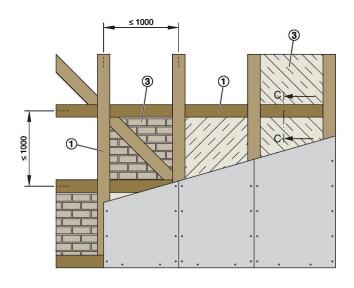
Lightweight partition wall with timber support structure and cladding on one side
